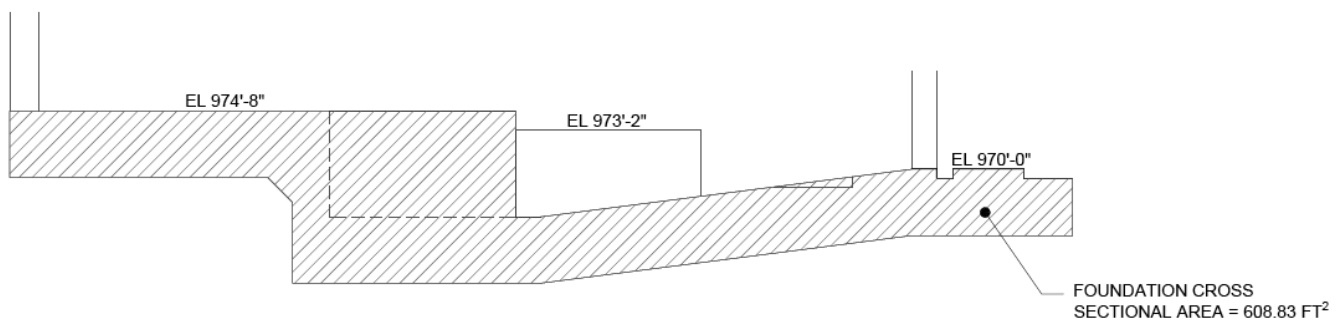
Southern Portion of Intake Structure Fdn; Cut Section Looking North
